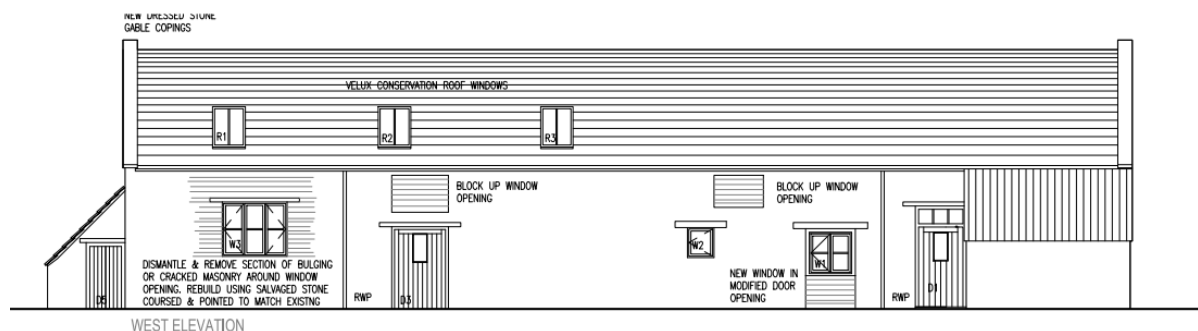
West elevation, as renovated. (Colin Moore Architect).
